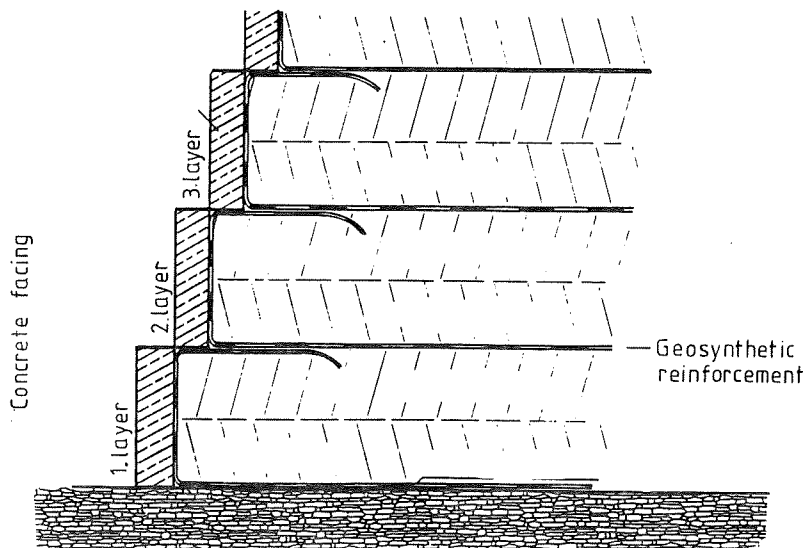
Cross section of a supporting structure reinforced with geosynthetics
